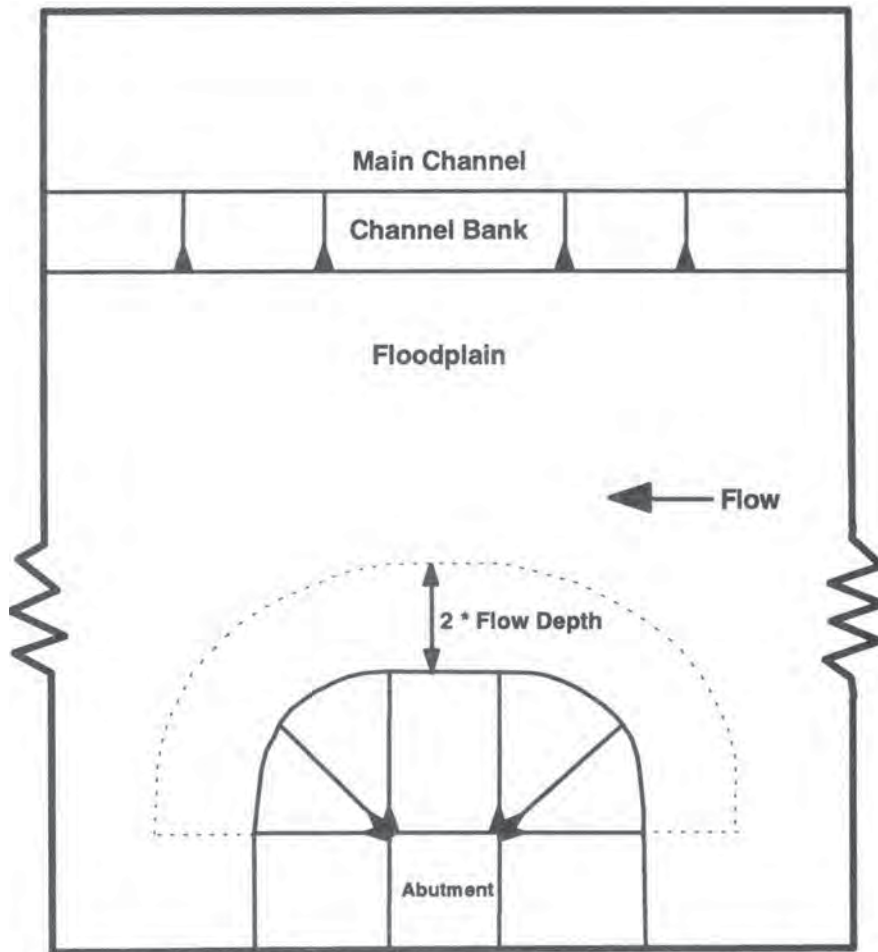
Plan view of the recommended extent of rock riprap apron (Lagasse et al., 1997).
